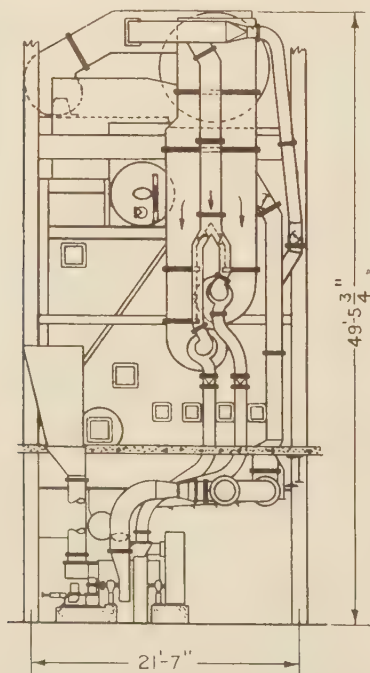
FRONT ELEVATION OF BABCOCK &amp; WILCOX INTEGRAL-FURNACE MULTIFUEL BOILER AT HARRISON GAS WORKS
